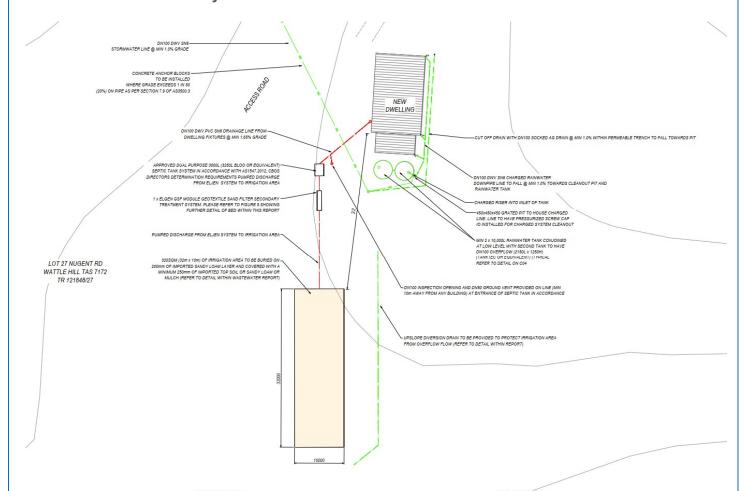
PROPOSED WASTEWATER SITE LAYOUT (DETAILED)
